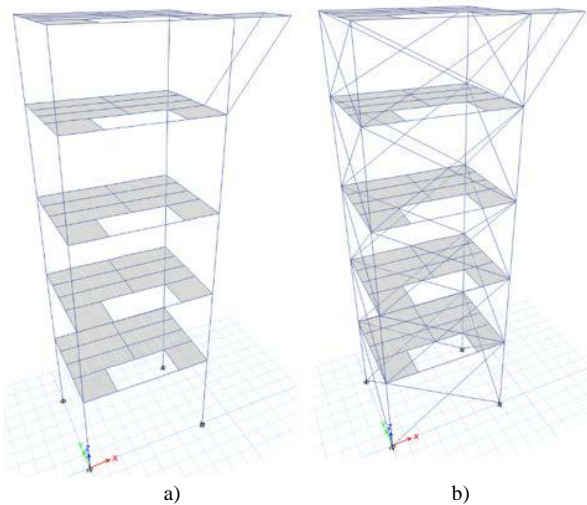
3D views of Model A – Moment Resisting Frames (a) and of Model B – Frames with cross braces (b)
